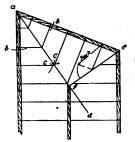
Illustrating how to determine where ridge pole and upper ends of hips will meet when end of roof is out of square
